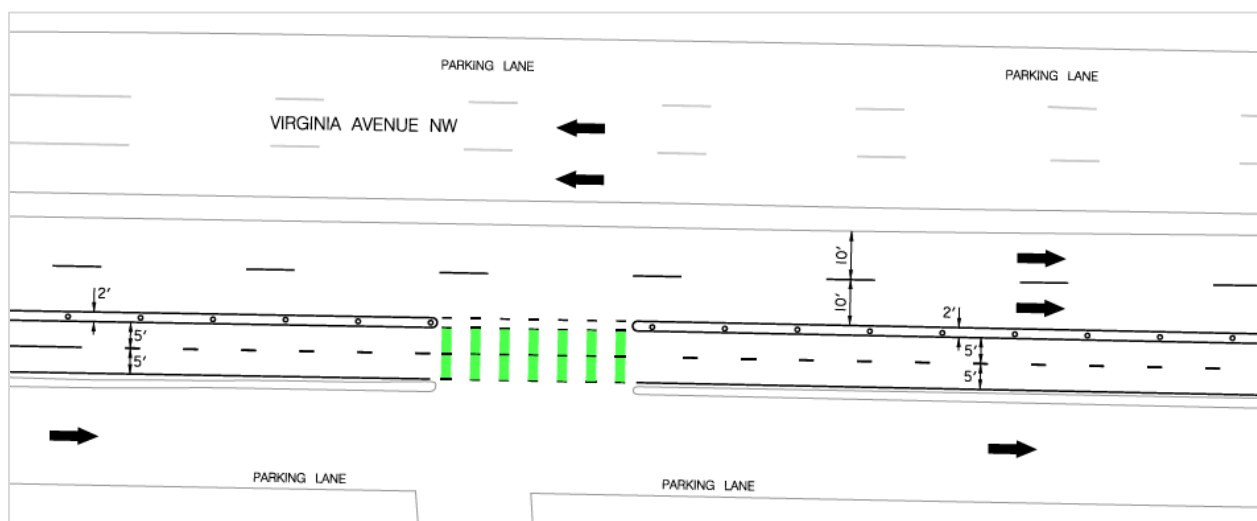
Typical plan view, proposed condition, Rock Creek Park Trail to New Hampshire Ave NW
